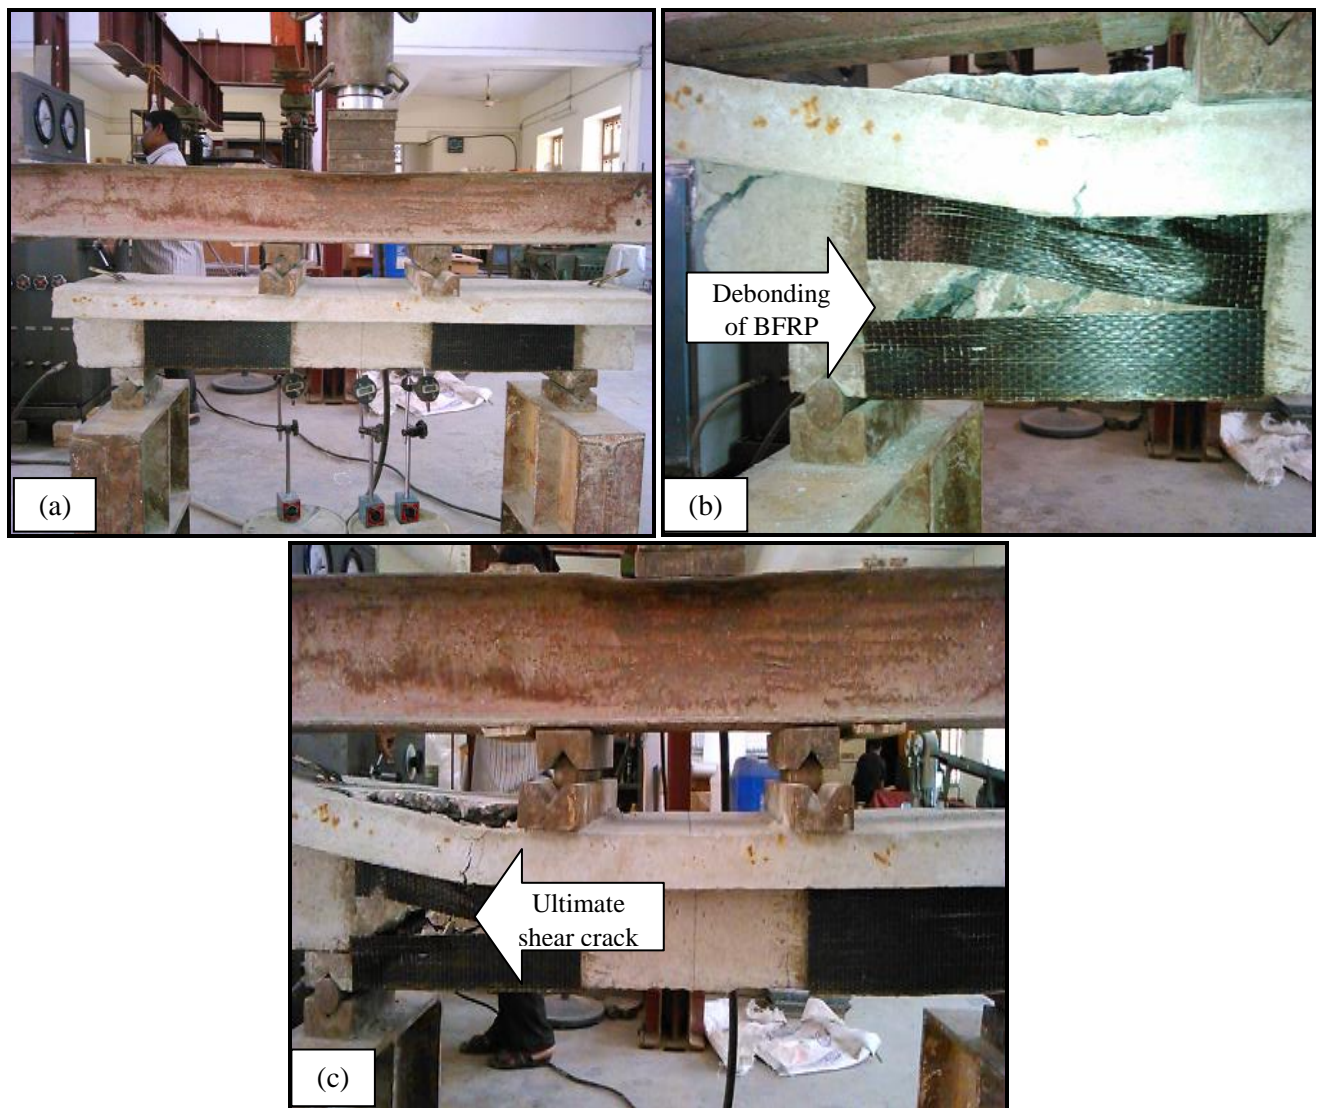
(a) Experimental Setup of beam SB2 under four-point loading system, (b) Debonding of BFRP sheet at ultimate load, (c) Ultimate failure of beam SB2 by debonding of BFRP sheet followed by diagonal shear crack
